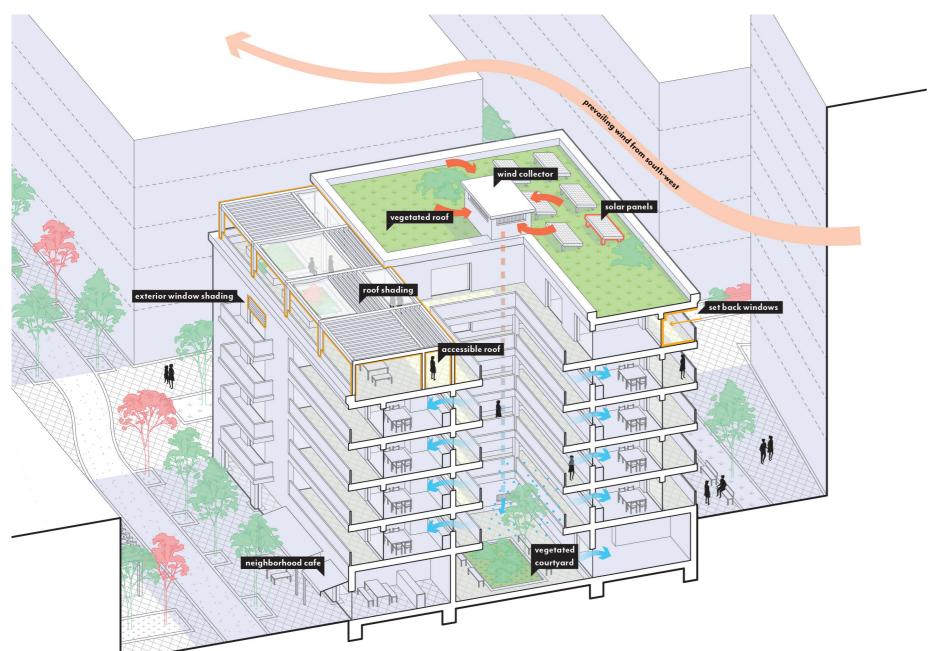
Examplary section of a residential building with climatic adaptations, rooted in the traditional Beiruti architecture.
